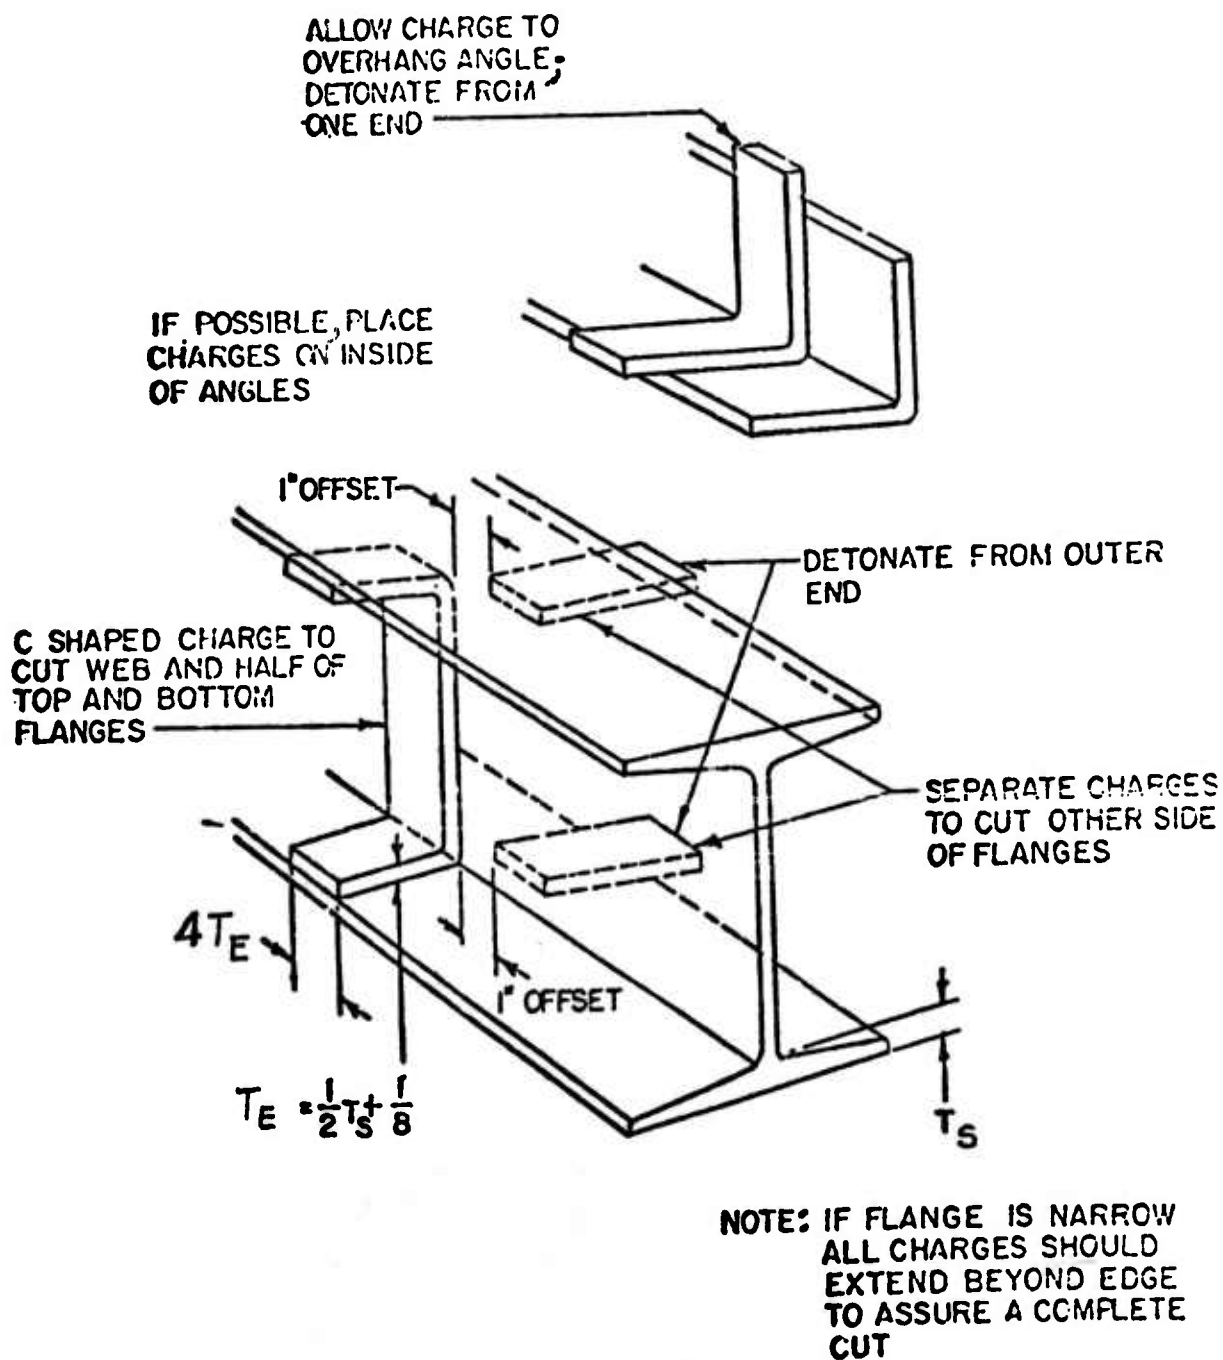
Charge placement and priming technique recommended by SRI for explosive cutting of steel beams.
